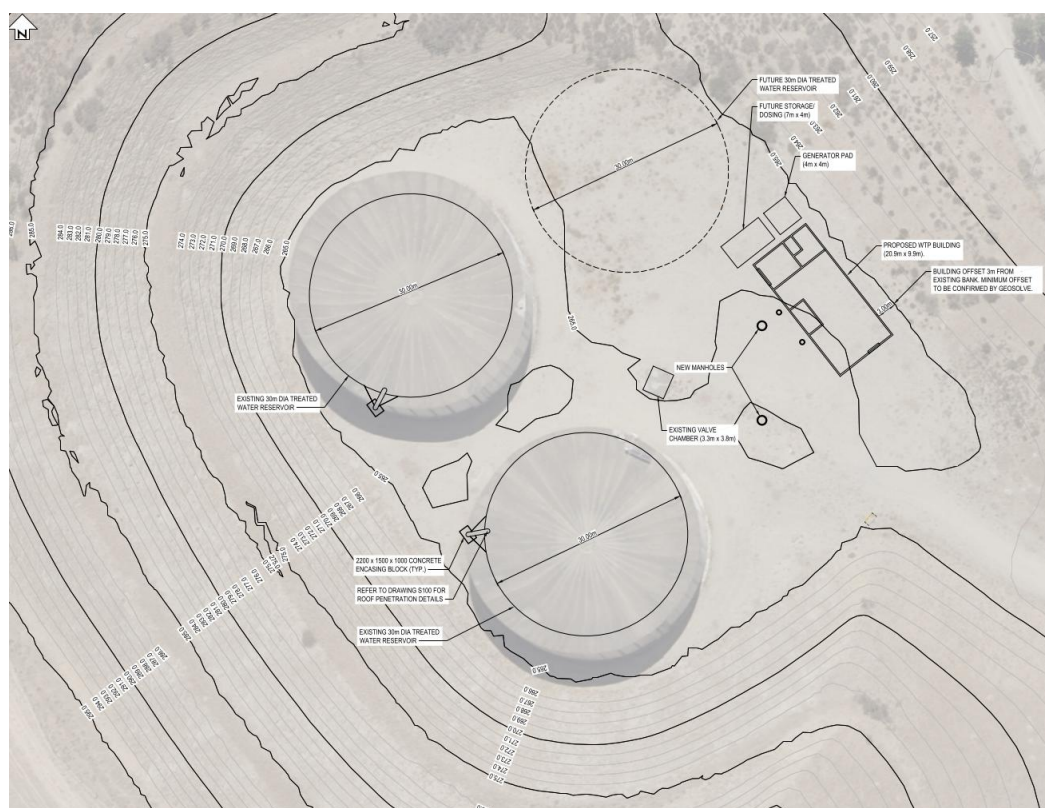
Water treatment plant building outline at reservoir site near McNab Road
